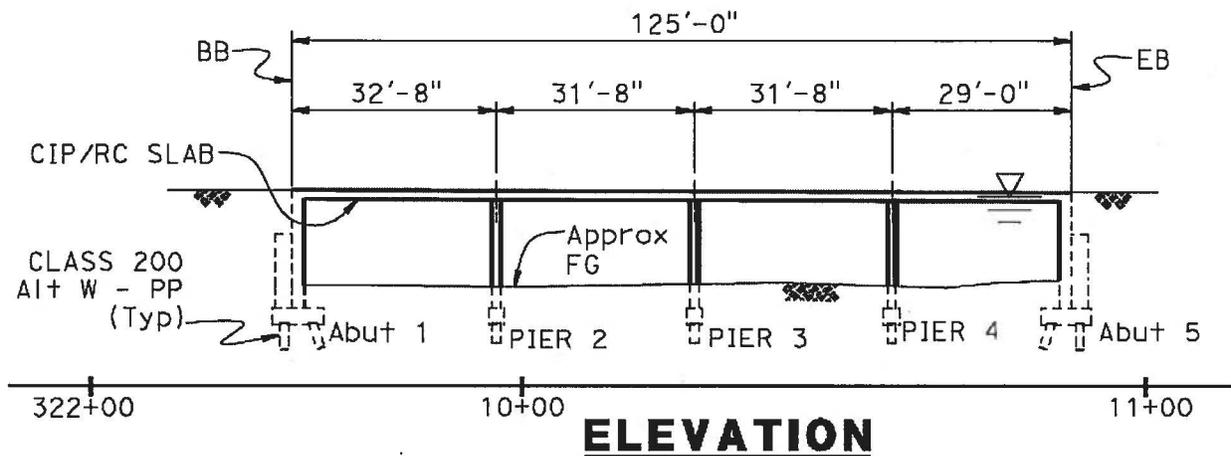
Elevation View of Proposed San Francisquito Creek Bridge
